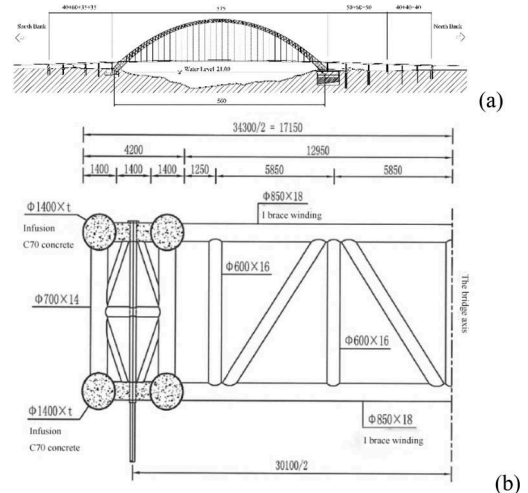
Main dimensions of Third Pingnan Bridge (a) overall layout (m); (b) arch ring section (mm).
